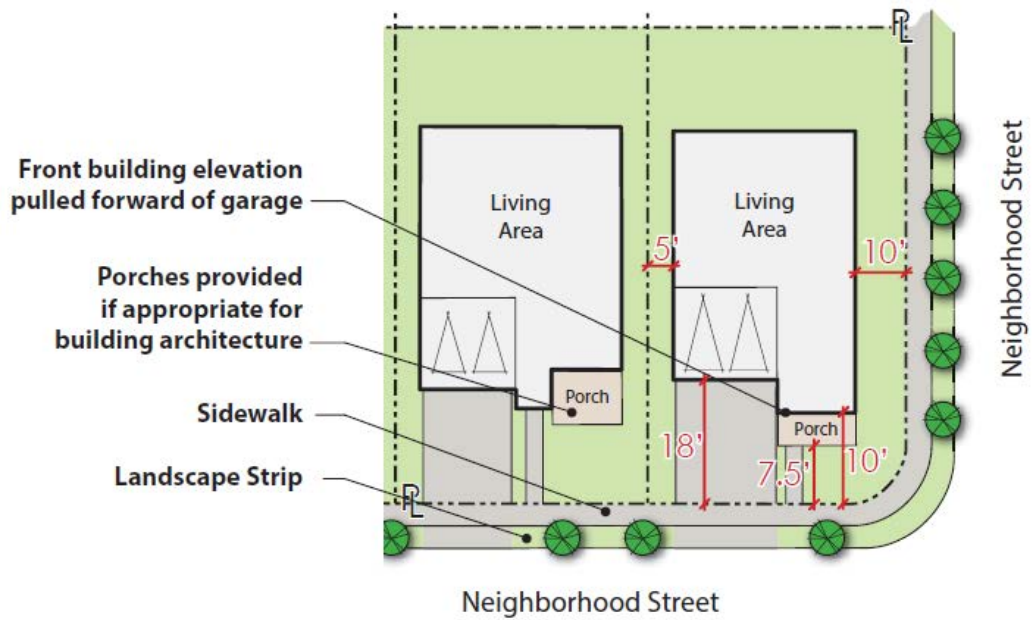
Village Center MDR (RS/DS) Single Family Side Elevation Details
